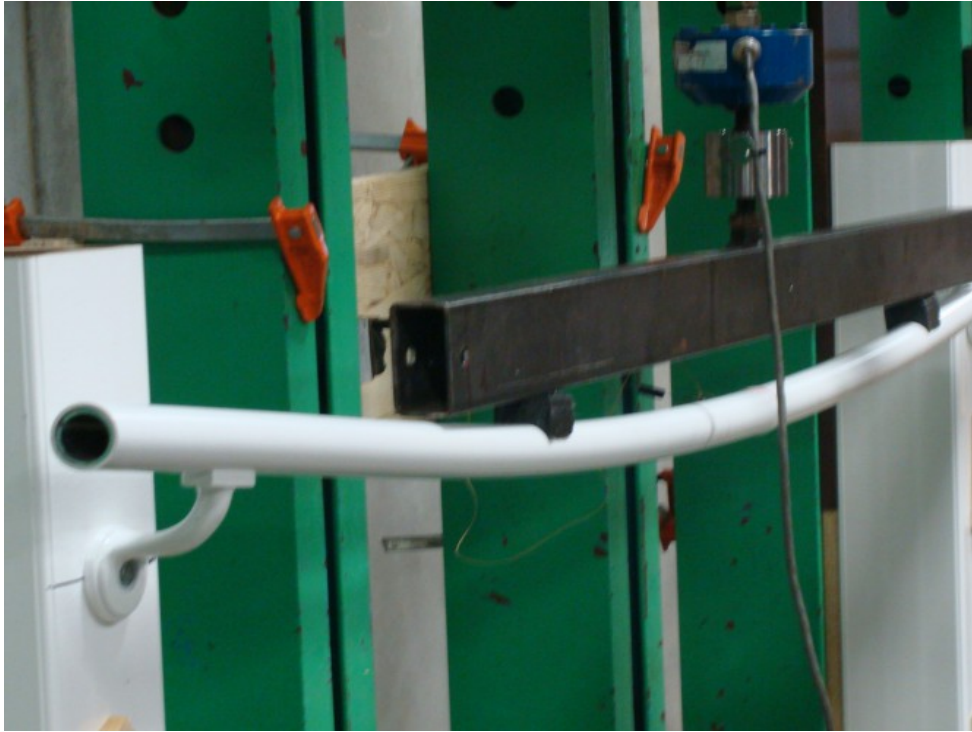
50 plf Load – Vertical (photo taken at 300 lbf)
